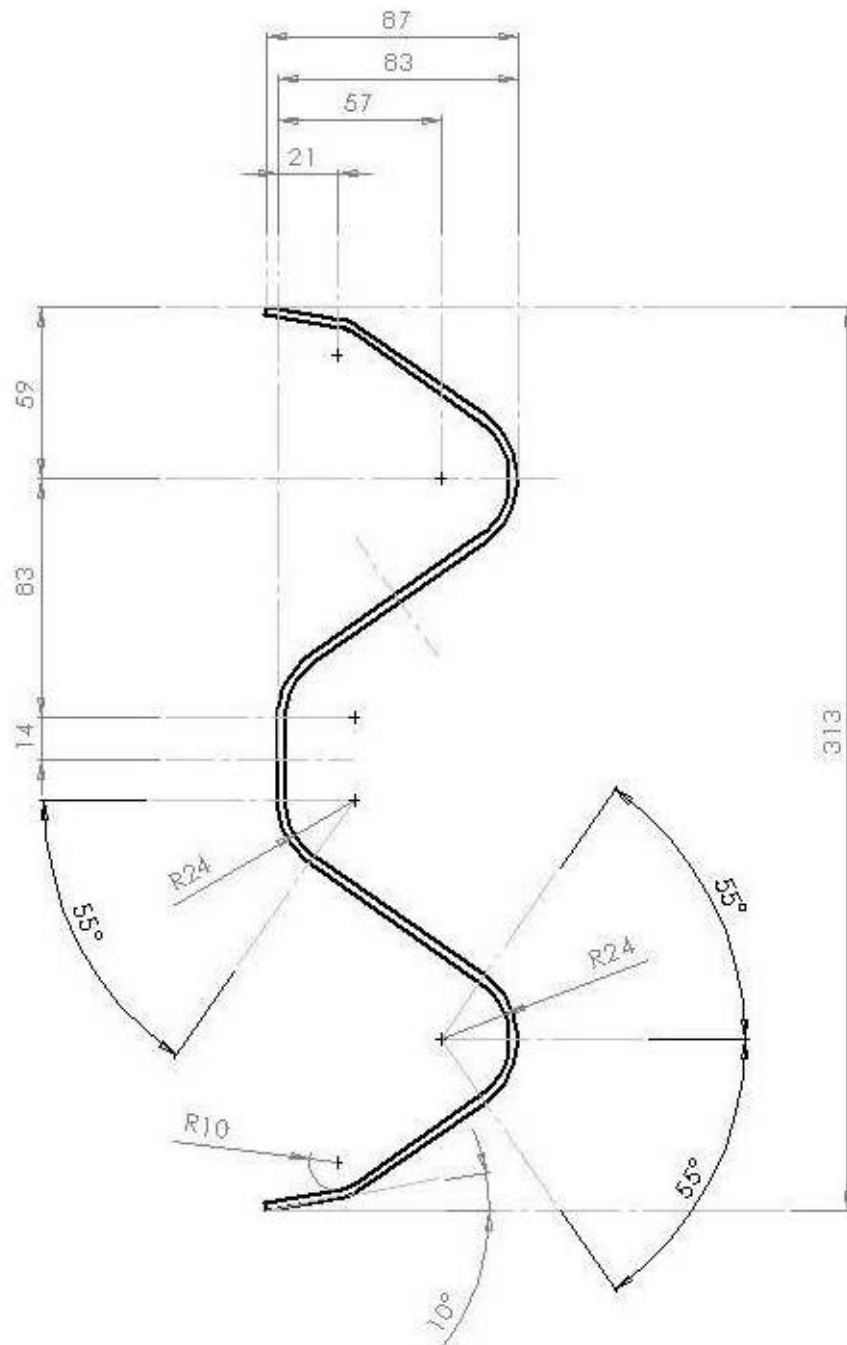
Dimensions of a W-beam guardrail. Dimensions are shown in both English and metric units. Thickness is 2.67 mm. Drawing from AASHTO-AGC-ARTBA.
